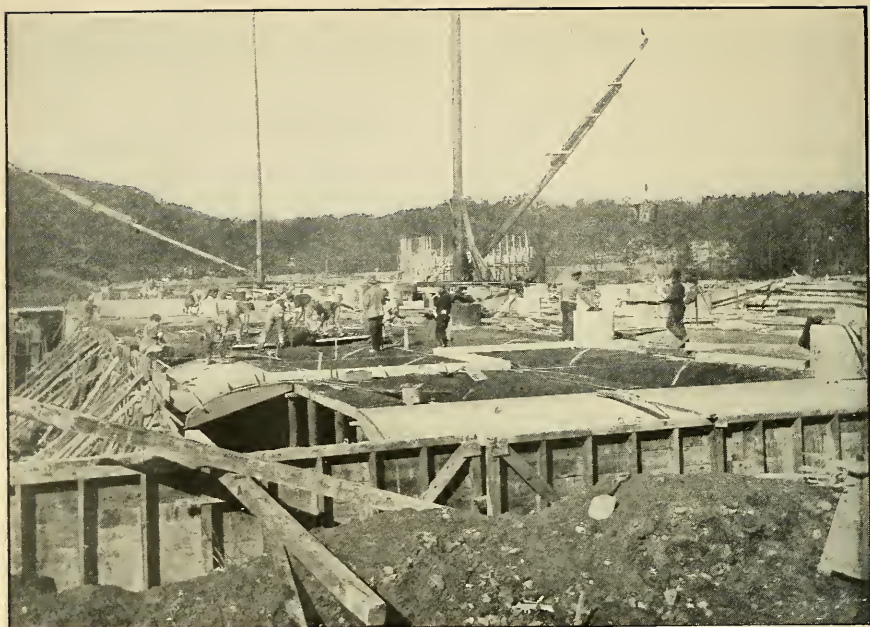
METHOD OF PLACING FILTER ROOF CONCRETE.
